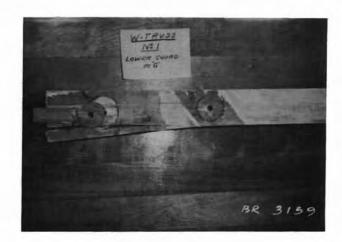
Failure in lower chord member of W-truss No. I, bottom view of member
